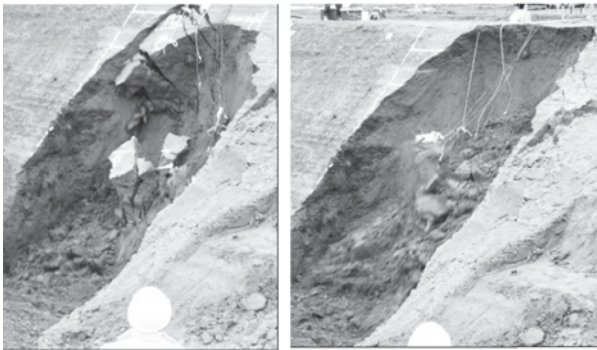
Slope failure after the cutting of 6th stage (Left: main failure, Right: delayed failure).
